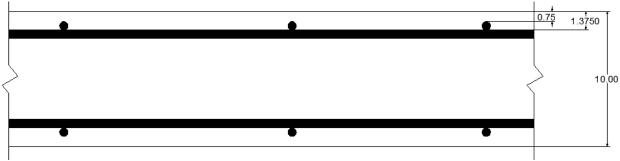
Section 'A' Showing Location and Cover of Slab Reinforcement
